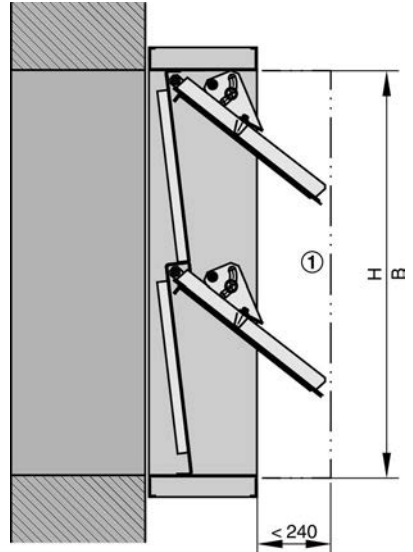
Wall installation without installation sub-frame (ARK-1 shown)
